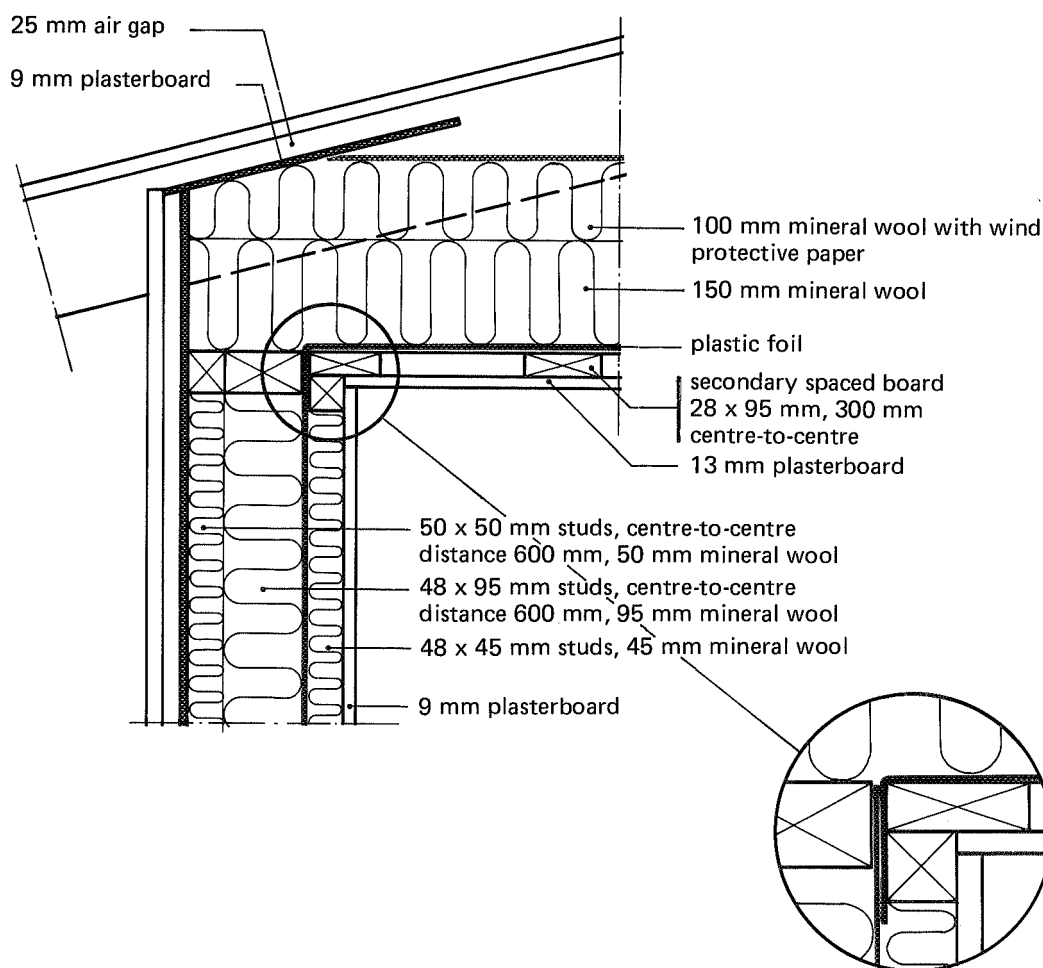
A joint at the eaves between external wall and roof construction. At the roof intersection, the plastic foils can be overlapped. The joints are clamped using the horizontal studs. Where wind protection is concerned, good continuity is achieved between wall and joist structure by using extra plasterboard sheet which fits tightly against the wall's plasterboard placed under the roof.
